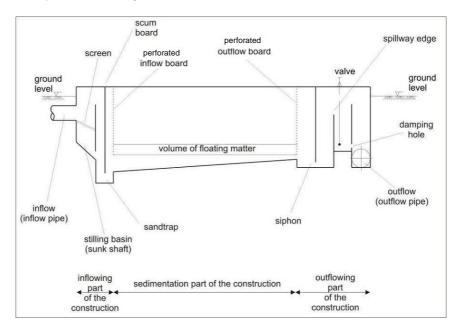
Typical design of concrete retention pond constructed at the Slovenian highway network
